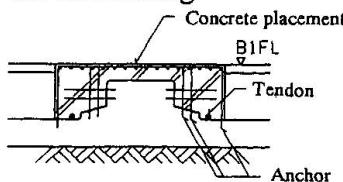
Reinforcement of Foundation Beam by Using Tendons
